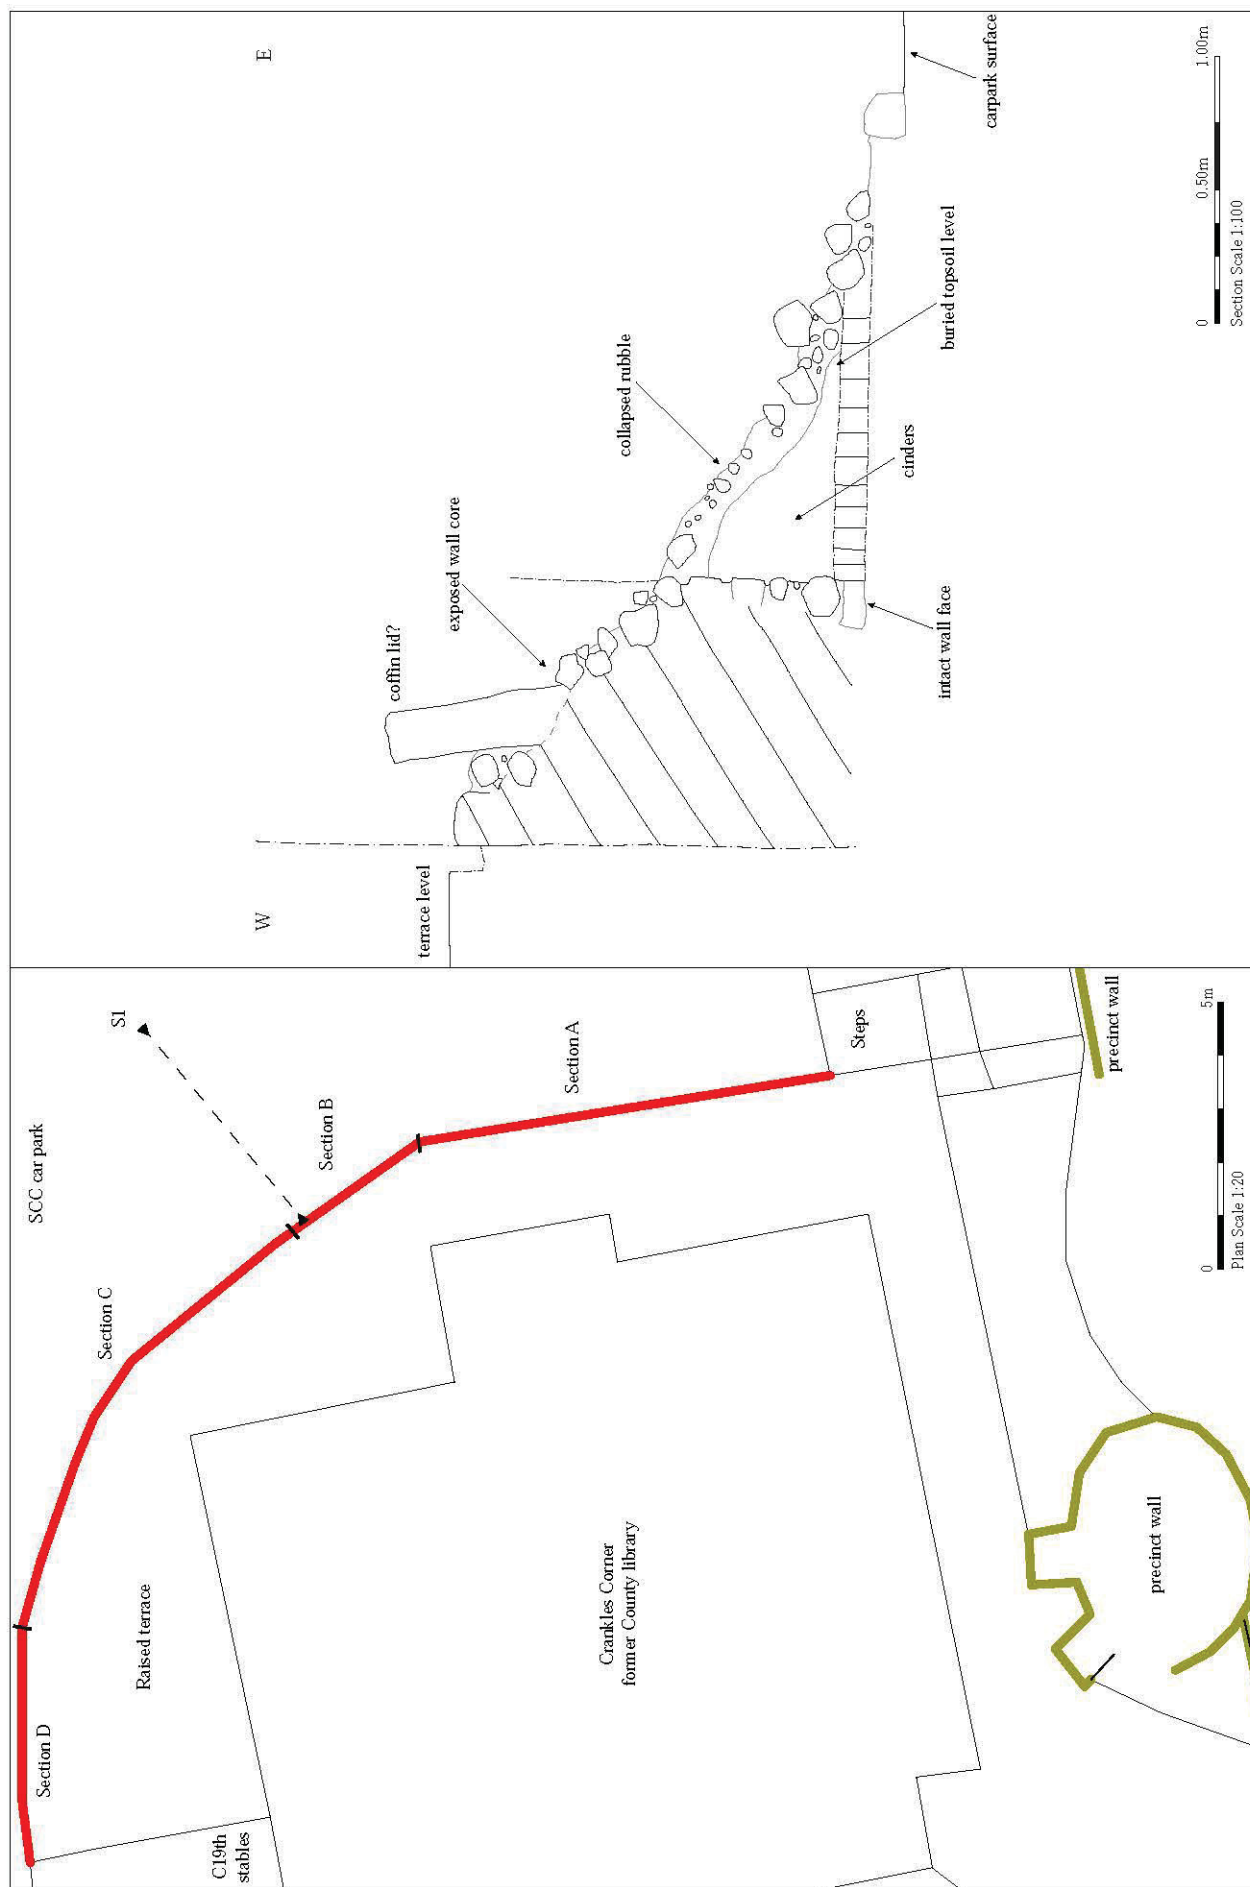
Plan showing the location of the wall length as described in the text (left) and (right) a cross section of the wall and the banked up rubble at S1 in Section B
